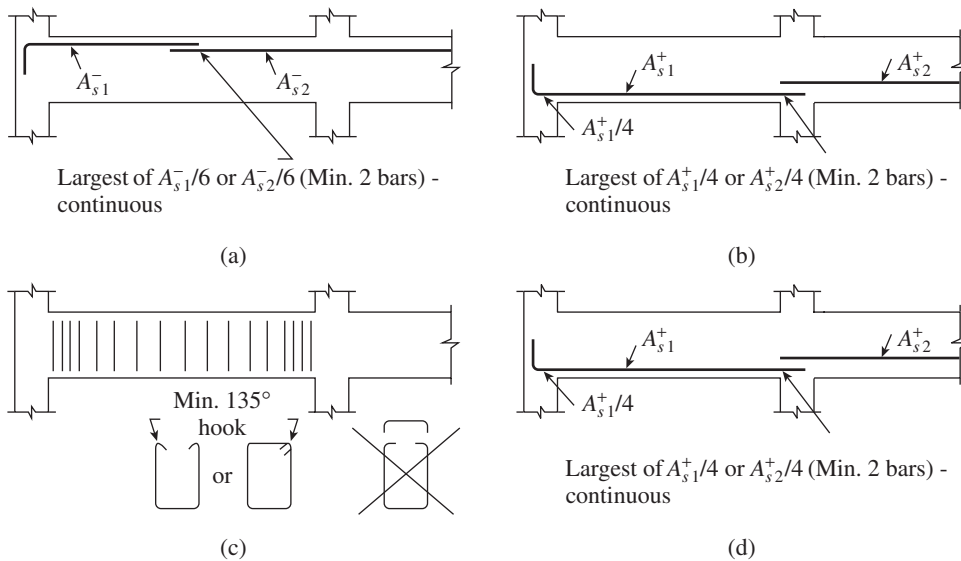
Structural integrity requirements in beams (a) Top bars of perimeter beams (b) Bottom bars of perimeter beams (c) Stirrups in perimeter beams (d) Bottom reinforcement interior beams
